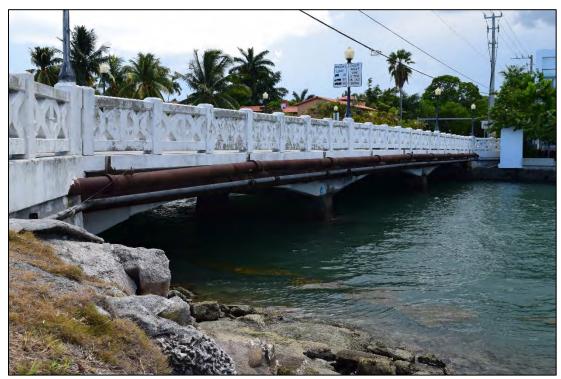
Venetian Causeway Bridge 9 (8DA14381), Facing Southwest
